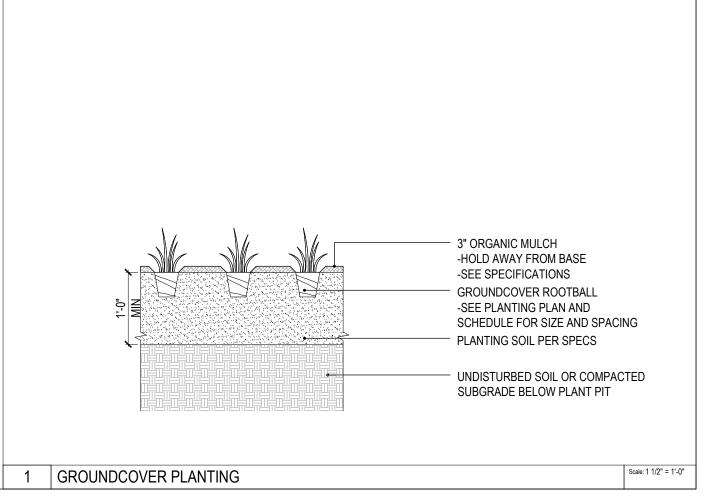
DETAILS - PLANTING -STREET IMPROVEMENTS
